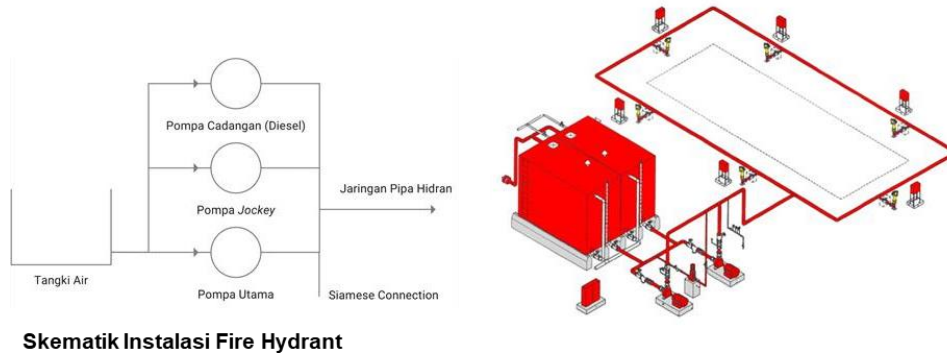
Schematic of Fire Hydrant Installation (source: <https://firehydrant.id/instalasi-hydrant-kebakaran/2021>)
